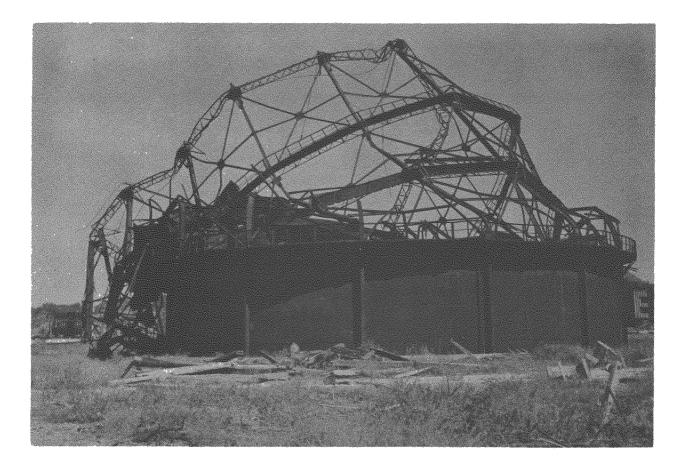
(3N). Storage tank, Urakami Gas Works. This tank was located 1,000 meters north of the center. (Photo File #NE 107.)
